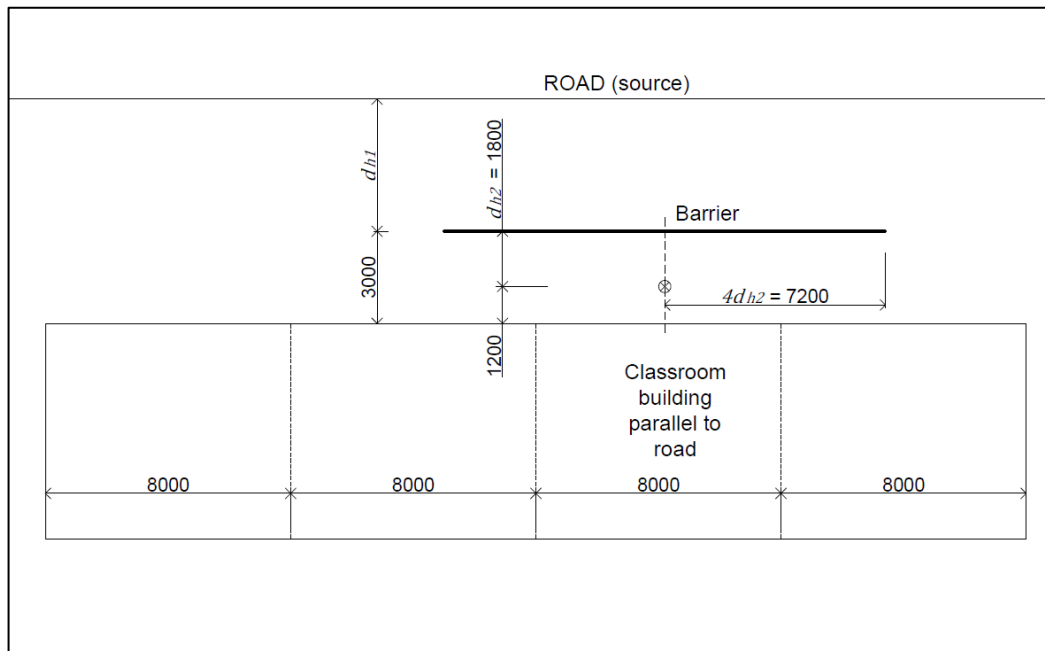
Illustration of determination of barrier length for building parallel to road
